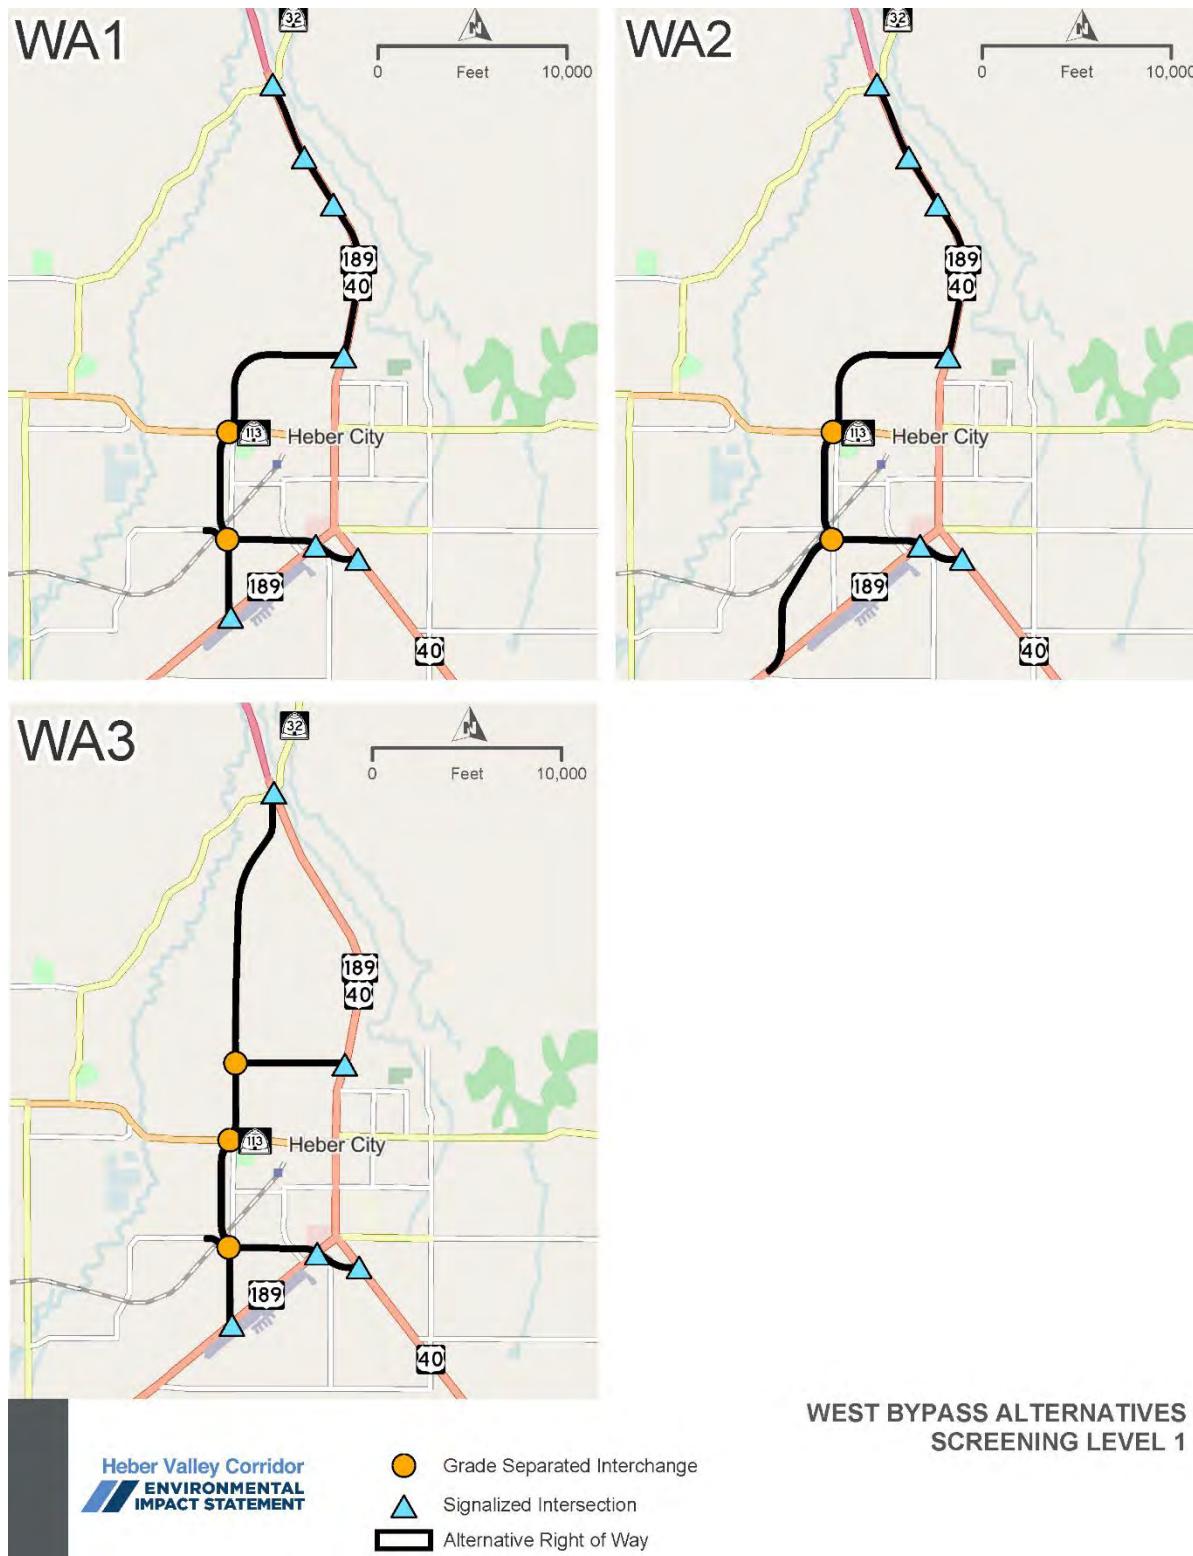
Level 1 Design Layouts for West Bypass Parkways
